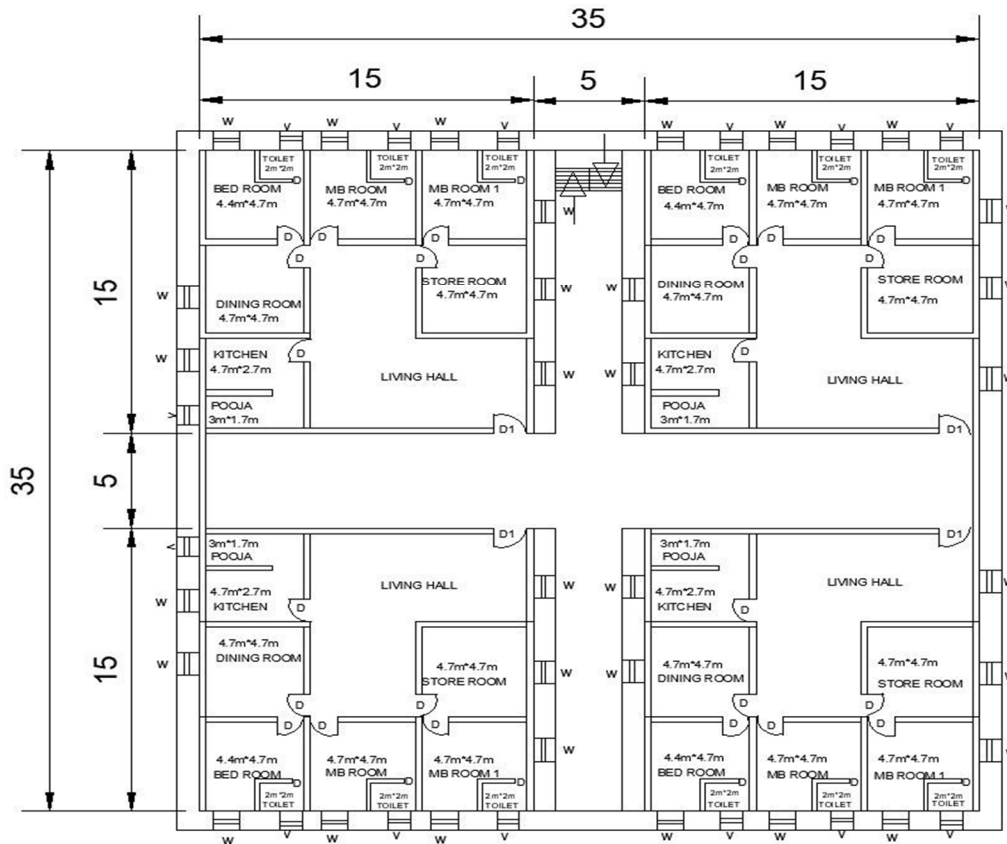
Architectural floor plan for the 5-storey RC frame buildings (35m×35m; plan identical for all storey’s).
